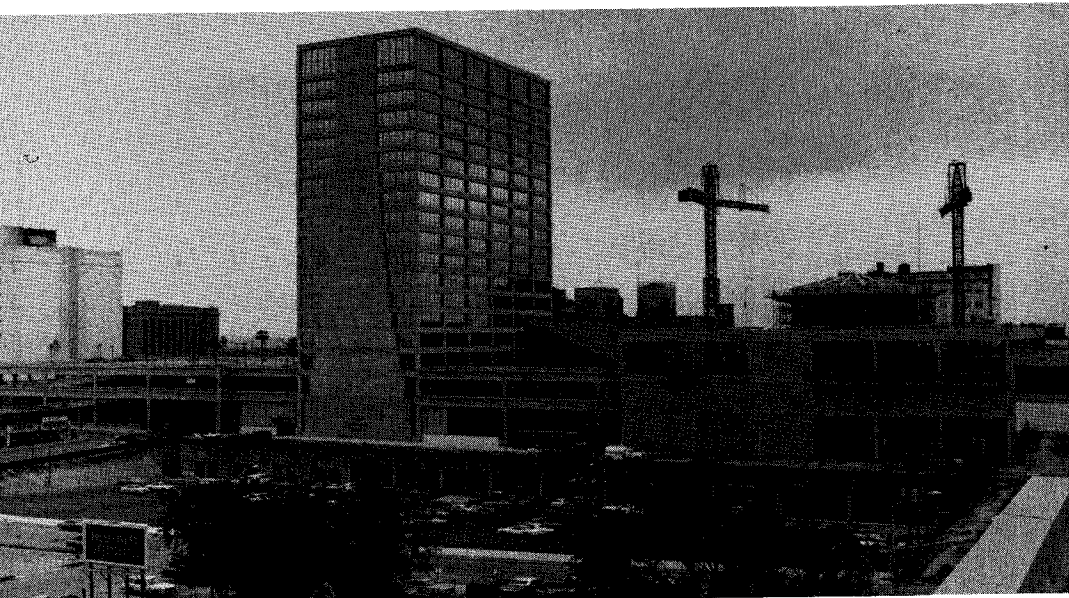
West elevation of the complex. To the left of the office tower is the parking structure, of precast concrete. A major city thoroughfare is bridged, also to the left of the tower. To the right is the ice rink atrium with a sloping roof—also in precast concrete construction.
